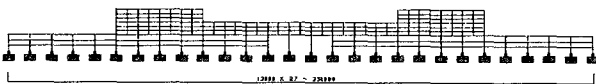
Structural elevation(X-axis, longitudinal direction)
